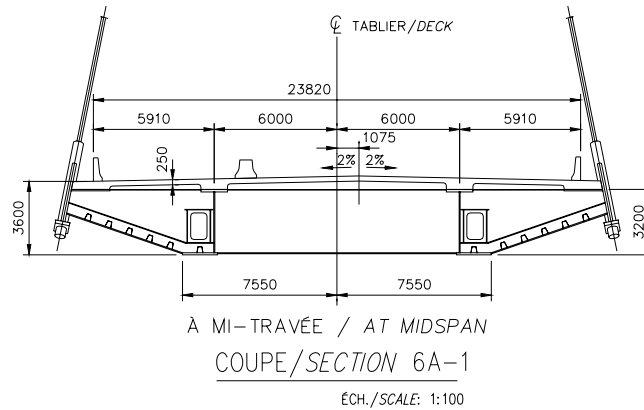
Cross-section – Cable-stayed bridge – Double box girder solution
